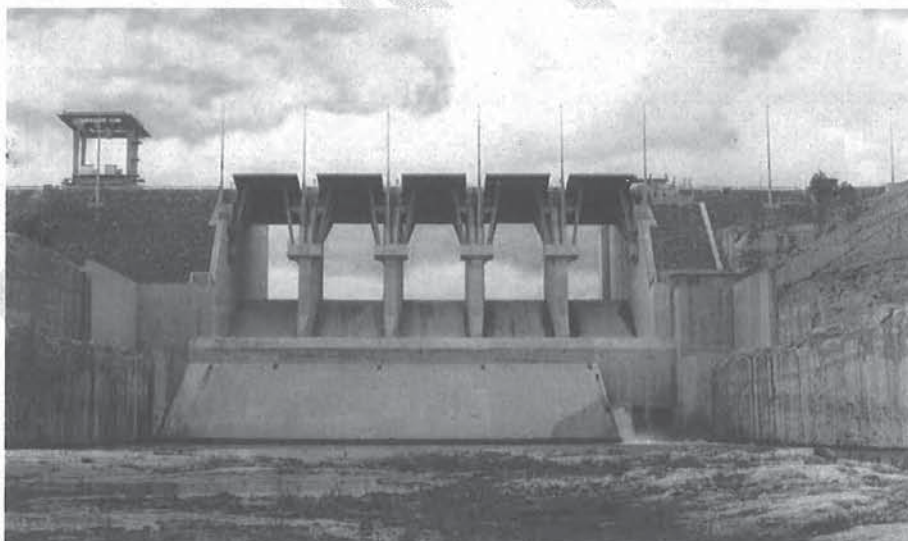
Wivenhoe Outlet and Spillway Plunge Pool Construction
